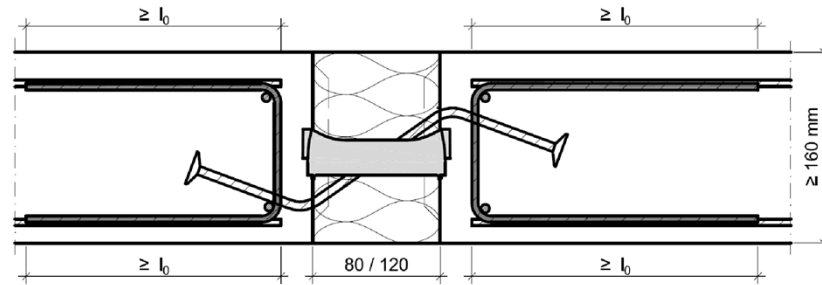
Example of Schöck Isokorb® Type Q with CCE (or SCE) and shear force bar  $\varnothing$  8 mm with anchor head (on both sides) and with stirrups  $\geq$  8 mm according to section D.1.2.8
